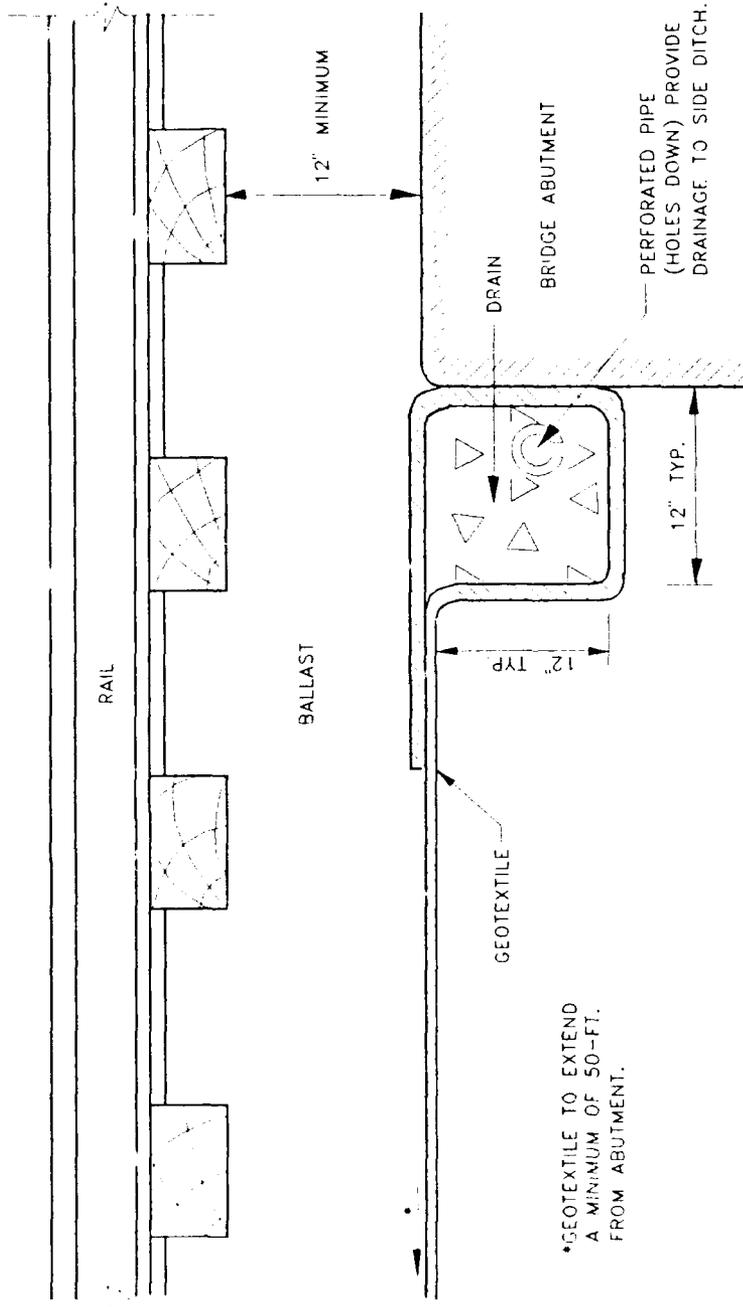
Plan view of geotextile installation and drainage provision in turnout area
